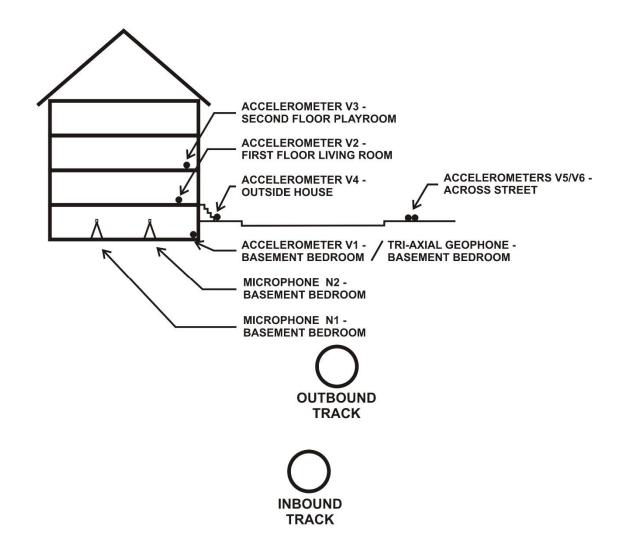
Cross-section Sketch (not to scale) of 1300 block of Park Road Indoor and Exterior Measurement Locations
